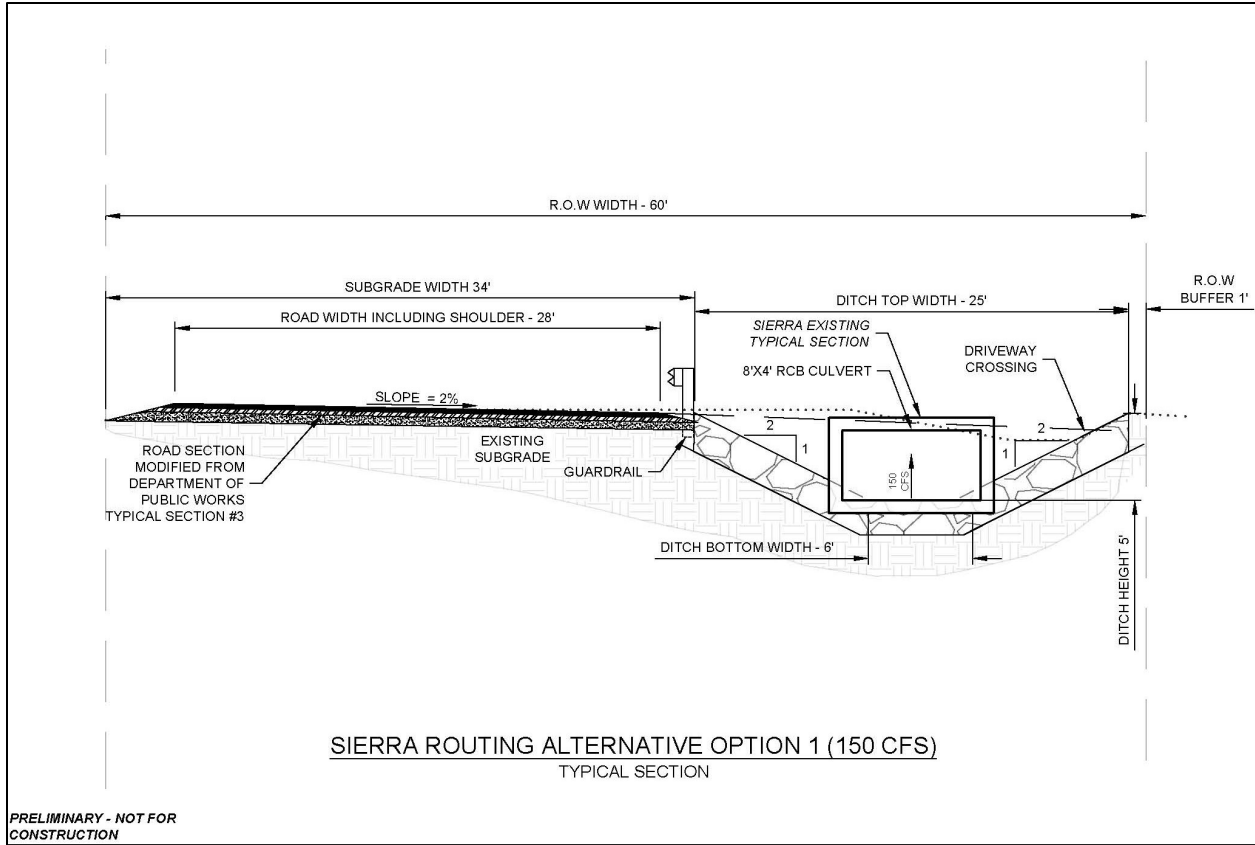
Typical section for the roadside ditch and RCB culvert layout for Sierra Routing Alternative Option 1.
